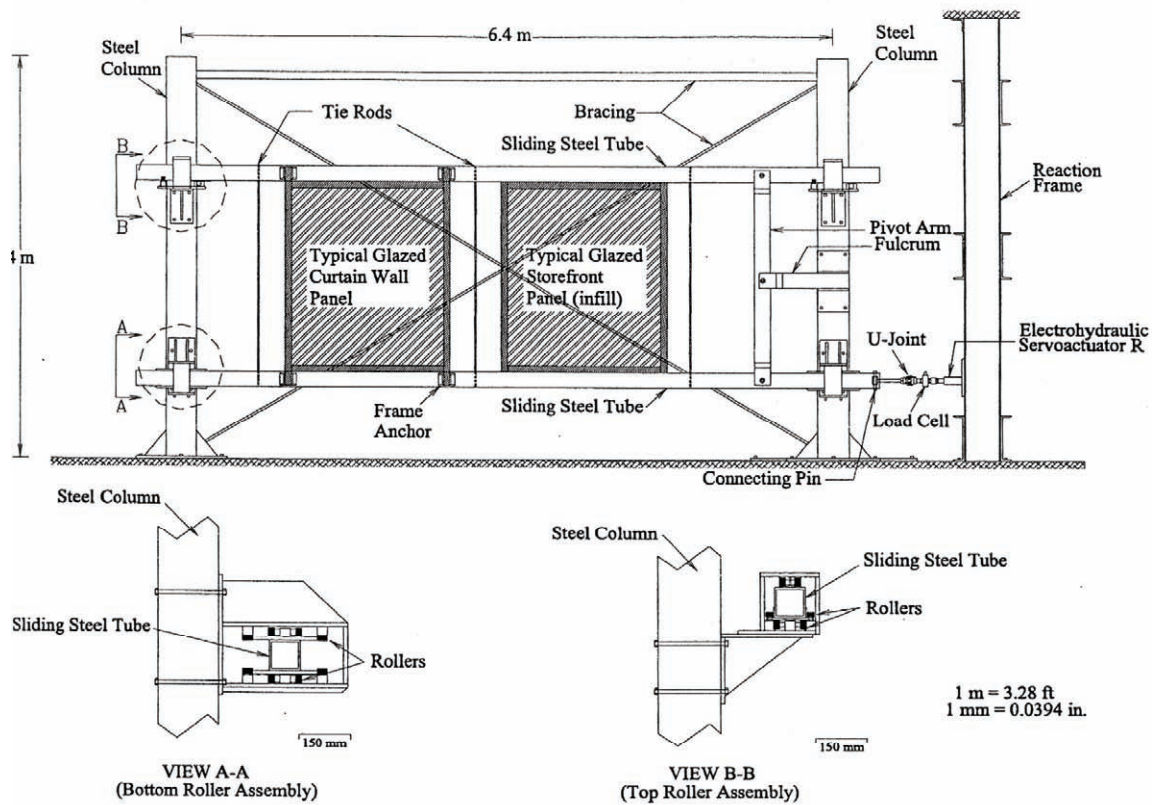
Example racking test facility at Penn State University with setup for testing curtain walls
